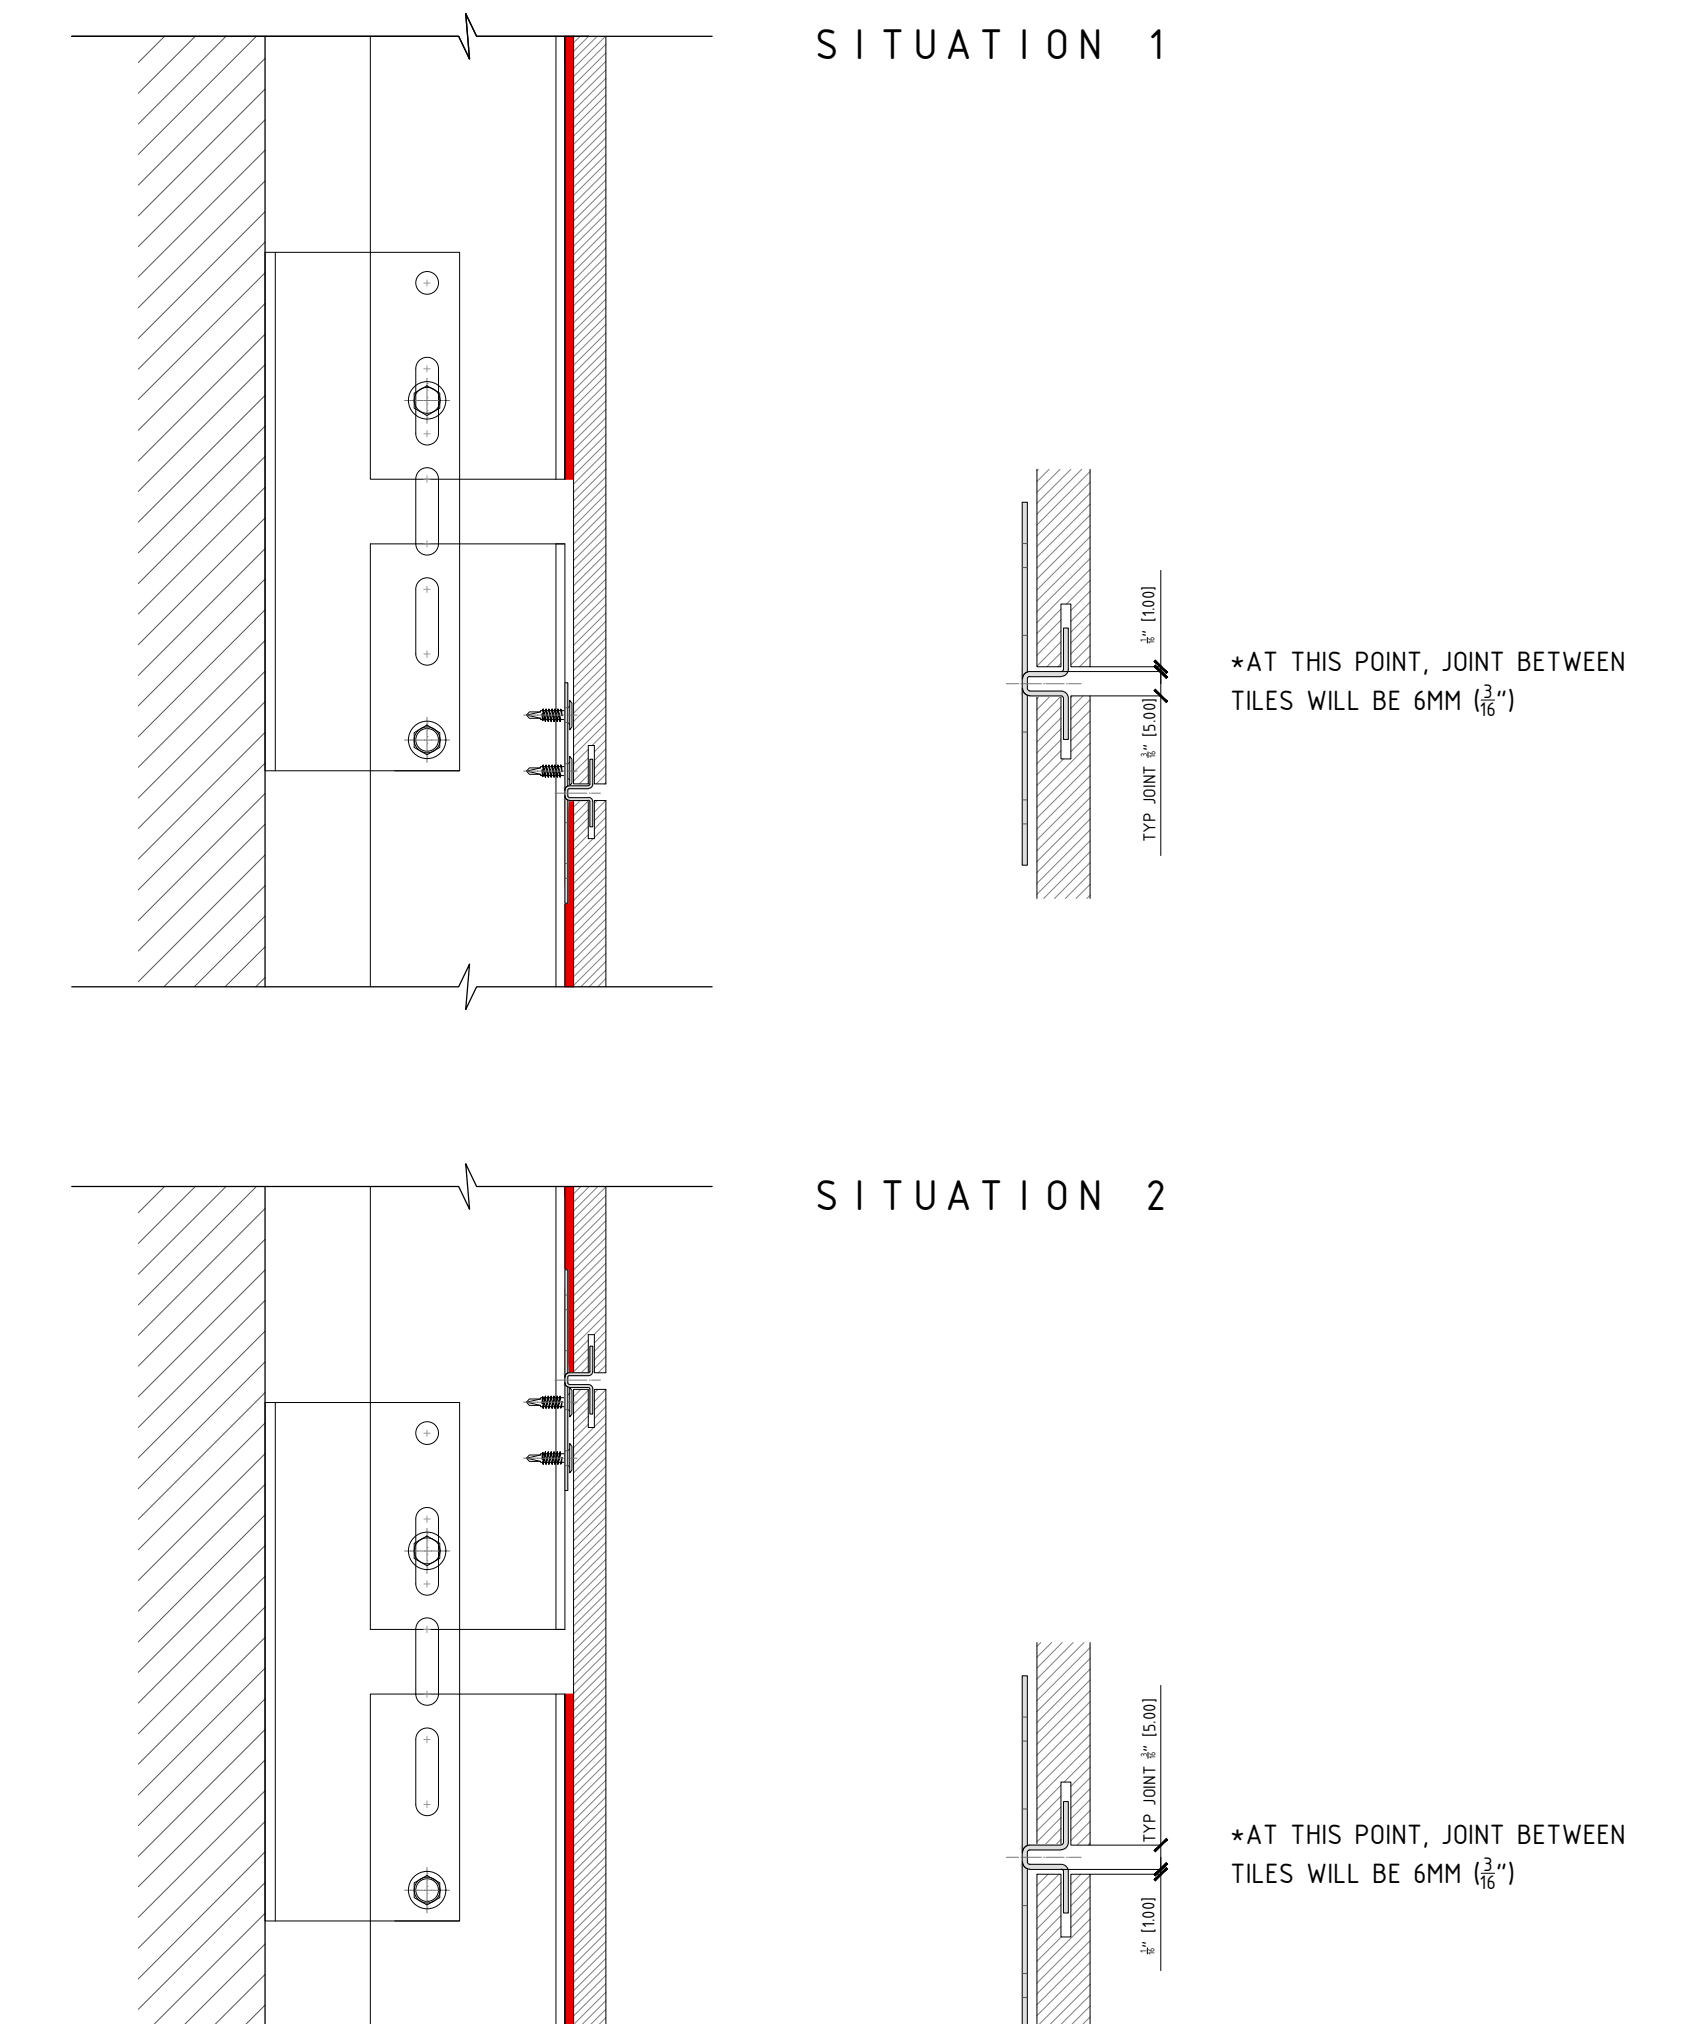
NO. OF FIXING POINTS AND LOCATION OF SPACER L-BRACKET
